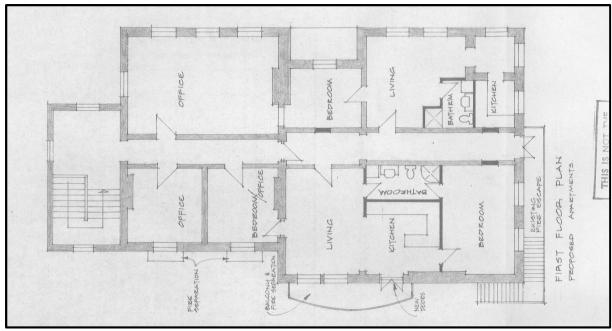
Alterations to the first floor proposed in 1999 (Hall & Mackenzie 1999). The labels on this plan are used when discussing the rooms in the text.
